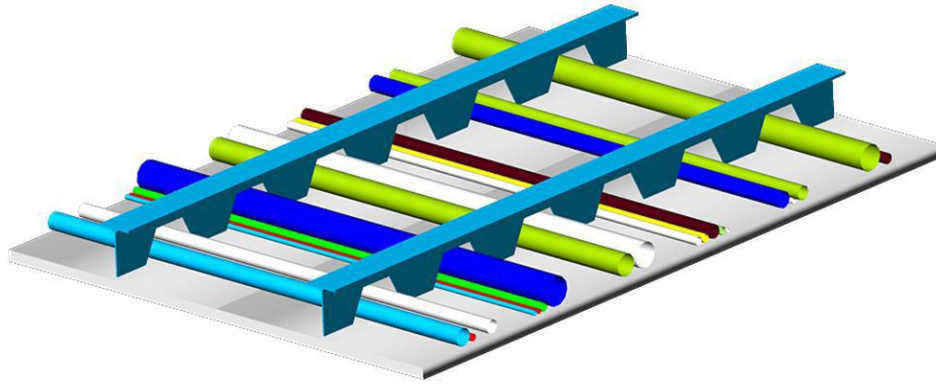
Novel type of composite slab with integrated installation floor using cellular beams: the concrete slab is placed on the bottom
